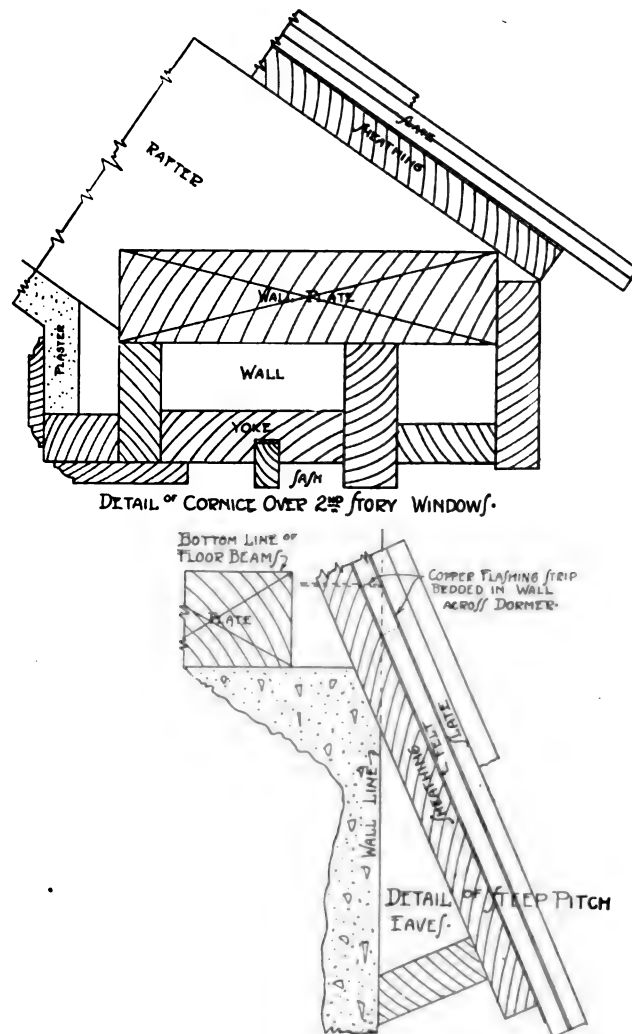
DETAILS CORNICE AND EAVES, MORRILL HOUSE
